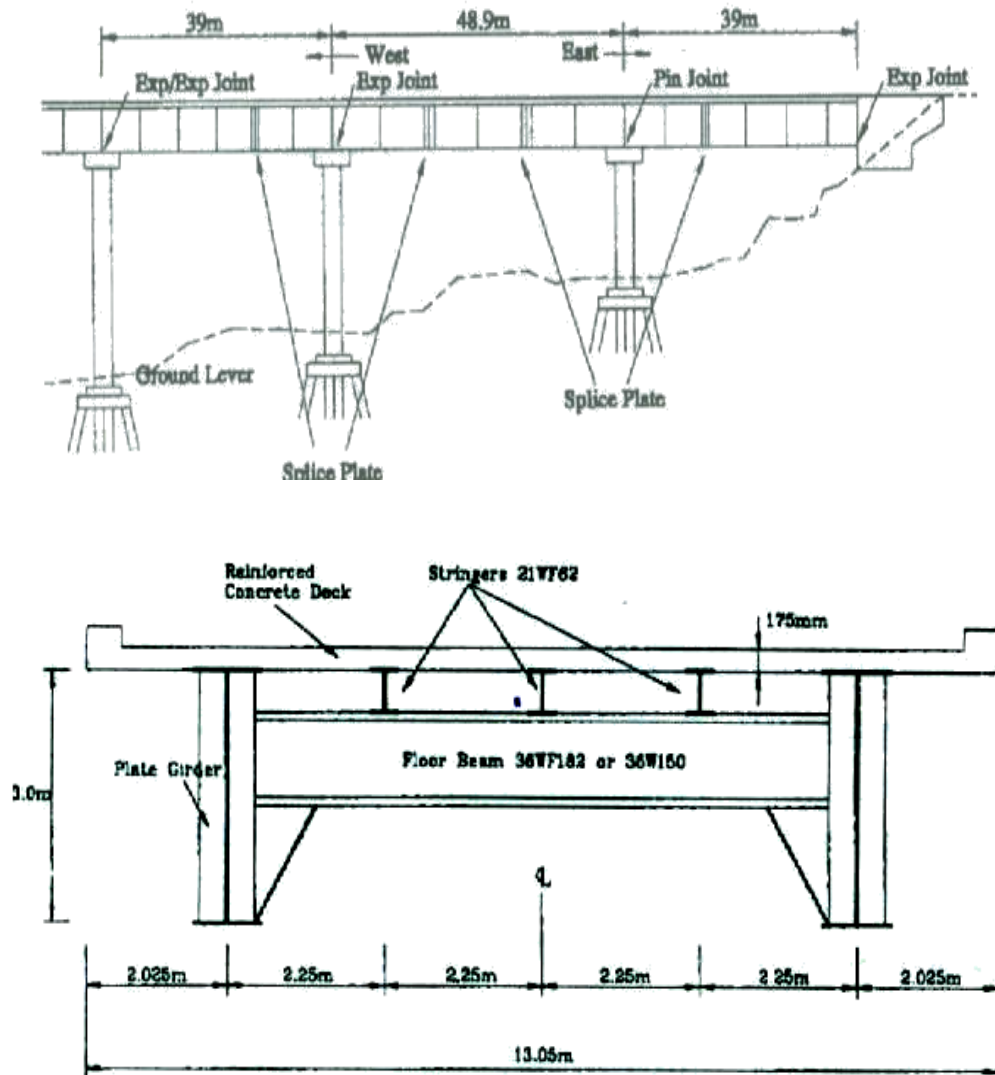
Schematic of Plate-girder test bridge (Kim et al 2003)
